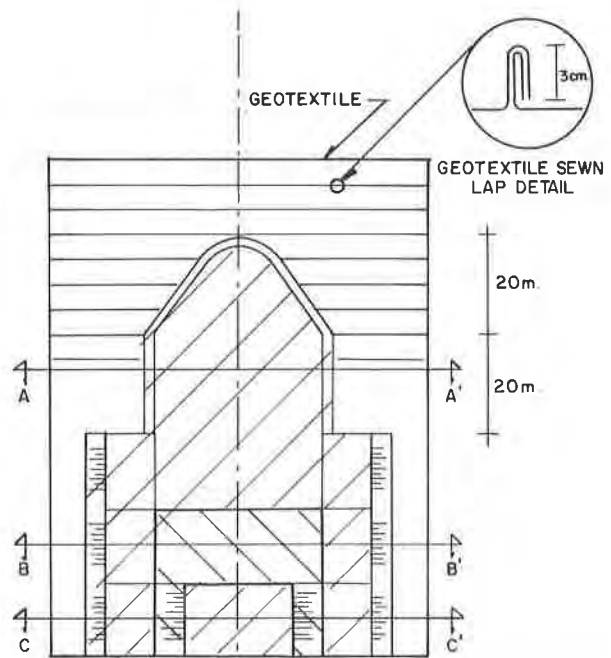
ARROW ATTACK LOADING AND CONSTRUCTION STAGES (PLAN VIEW)
